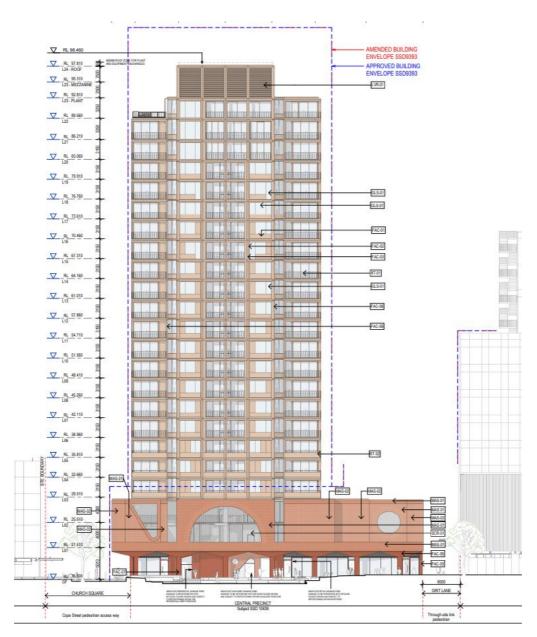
| East Elevation towards Cope Street Plaza (source: Applicant's RtS)
